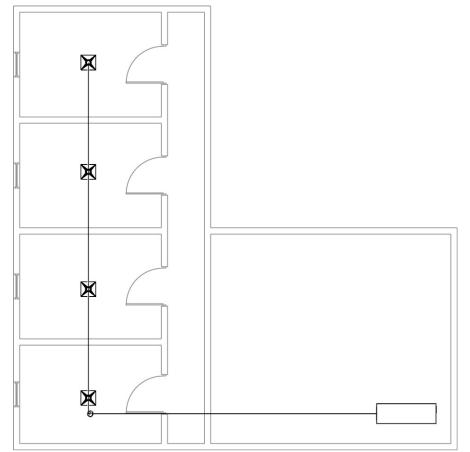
The drawing after connecting the diffusers to the air handling unit
